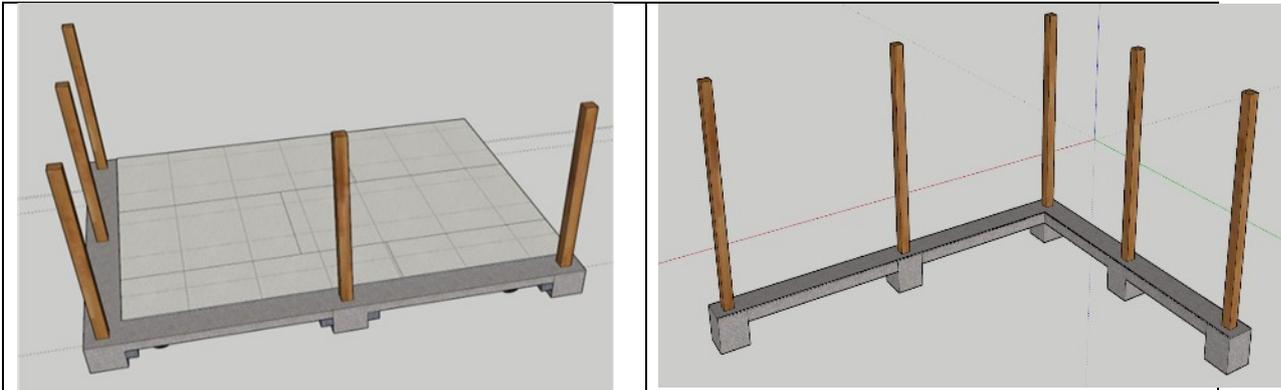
Schematic of test platform and pre-prepared footing assembly prior to mounting on platform
